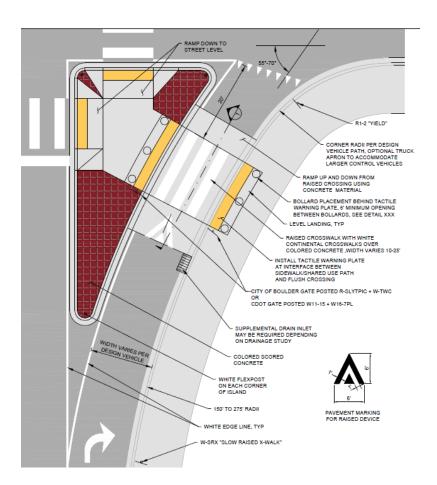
Typical Layout of Raised Crossing at Channelized Right Turn Location
